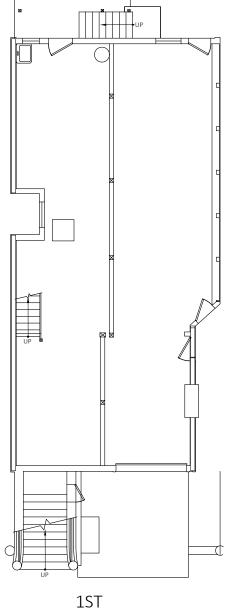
NEW WALLS CONVERTED DOUBLE-PARLOR TO BEDROOM ON ENTRY LEVEL
